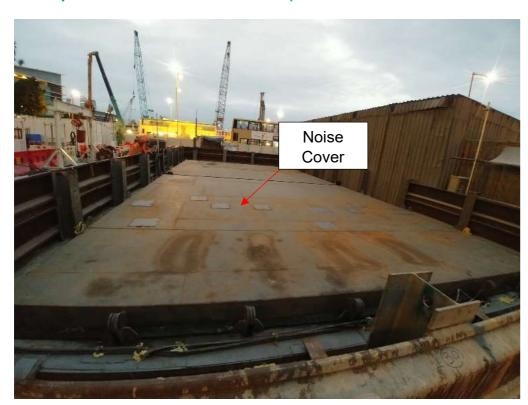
Sample Photo of Noise Cover (Central Kowloon Route – Centre Tunnel)
